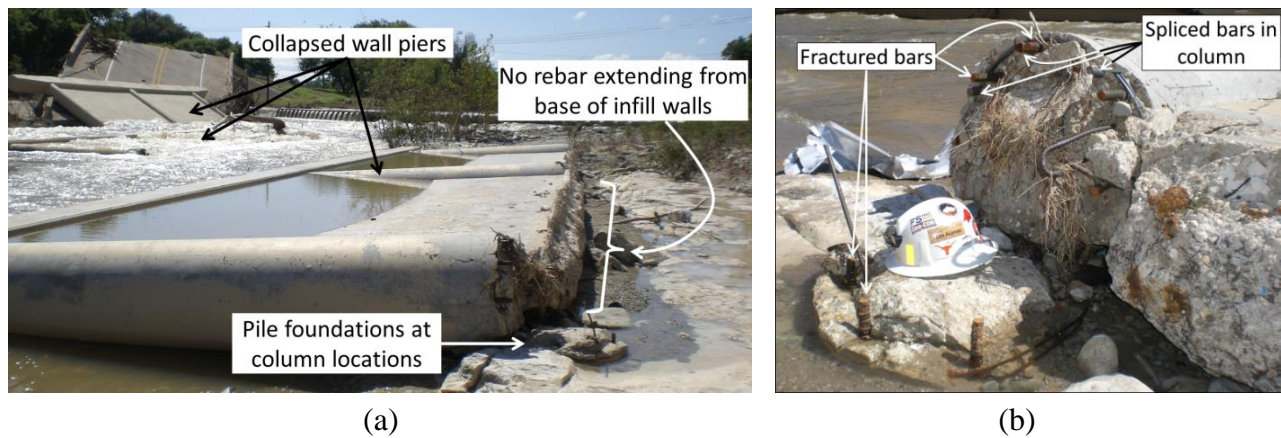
Collapsed wall piers. (a) section failure at base and (b) splice at base of pier columns
